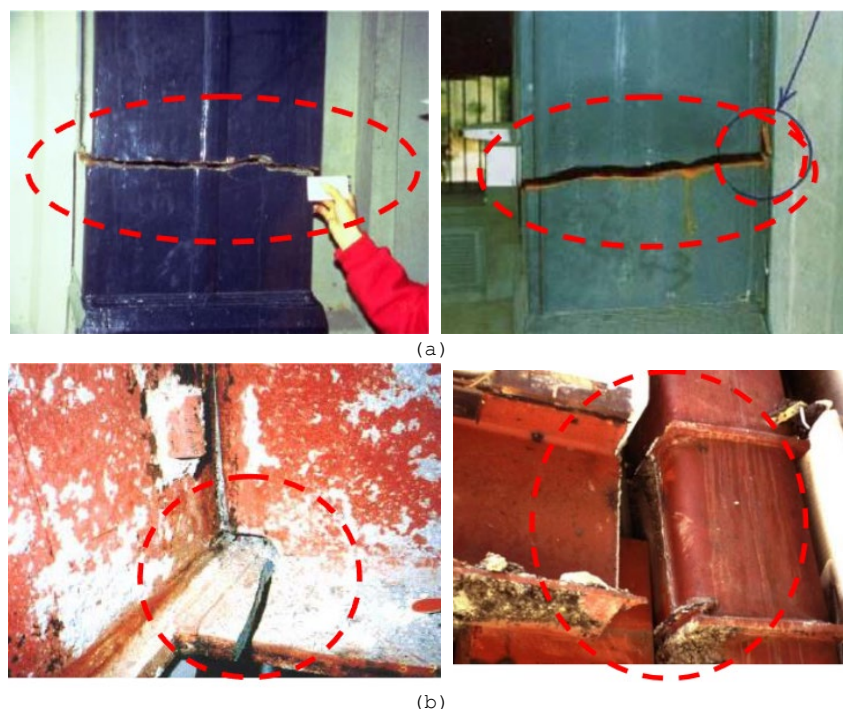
Structural Failures in the Kobe Earthquake: (a) Column Damage, (b) Beam-to-Column Fracture [4]
